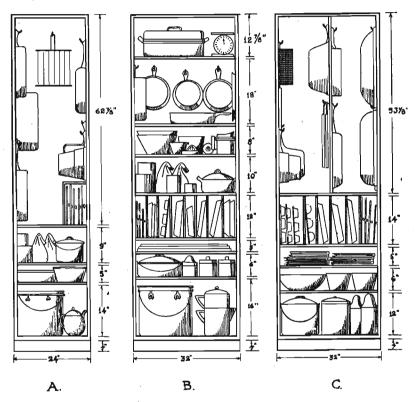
Floor to-ceiling cabinets used when stove center and mixing center are combined.
